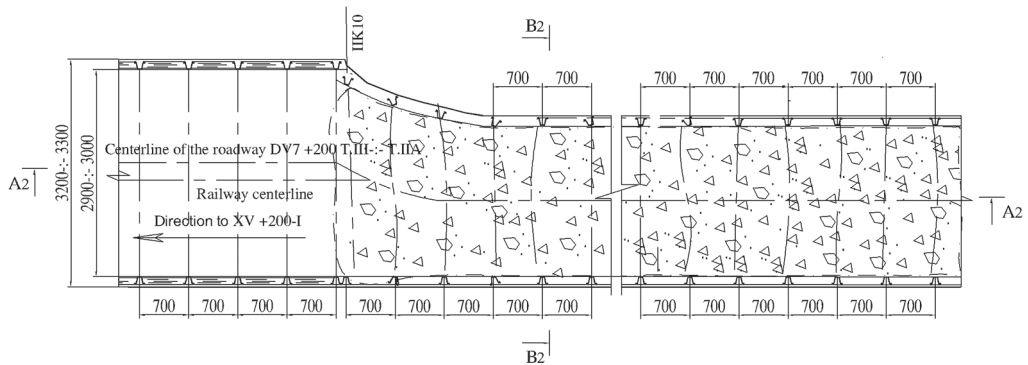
Existing plan view of the strike roadway at level +200, seam 6, before slashing and restoration (8)
